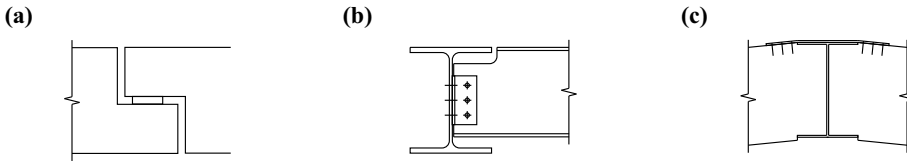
Hinge forms: (a) connection between beams with dapped ends, (b) shear connection for a secondary beam, (c) ridge joint in a timber roof structure
